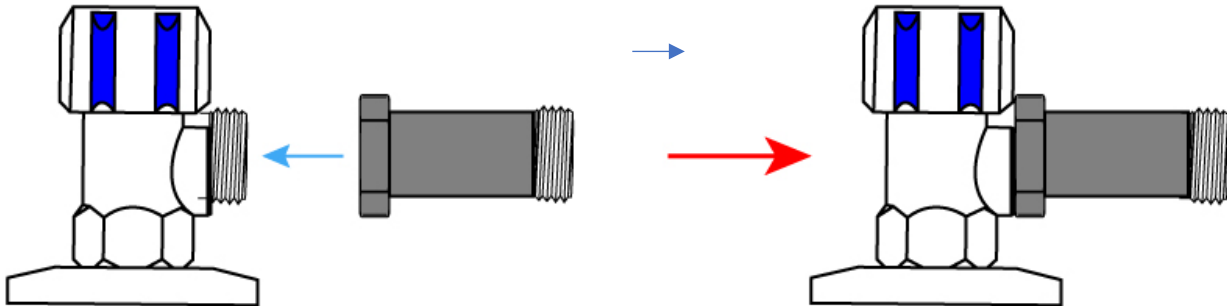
Install Dual Check Valve onto Cold-Water Stop Tap
